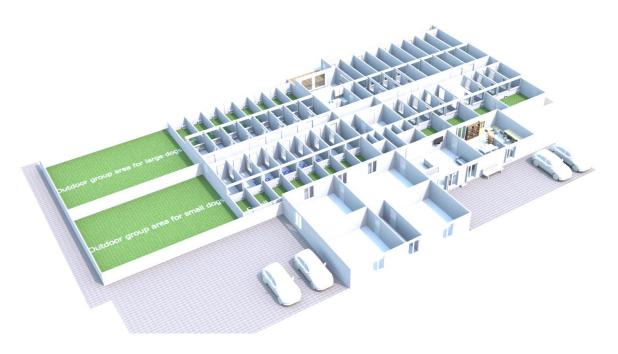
The 2D plan converted into a 3D image, left side aerial view
